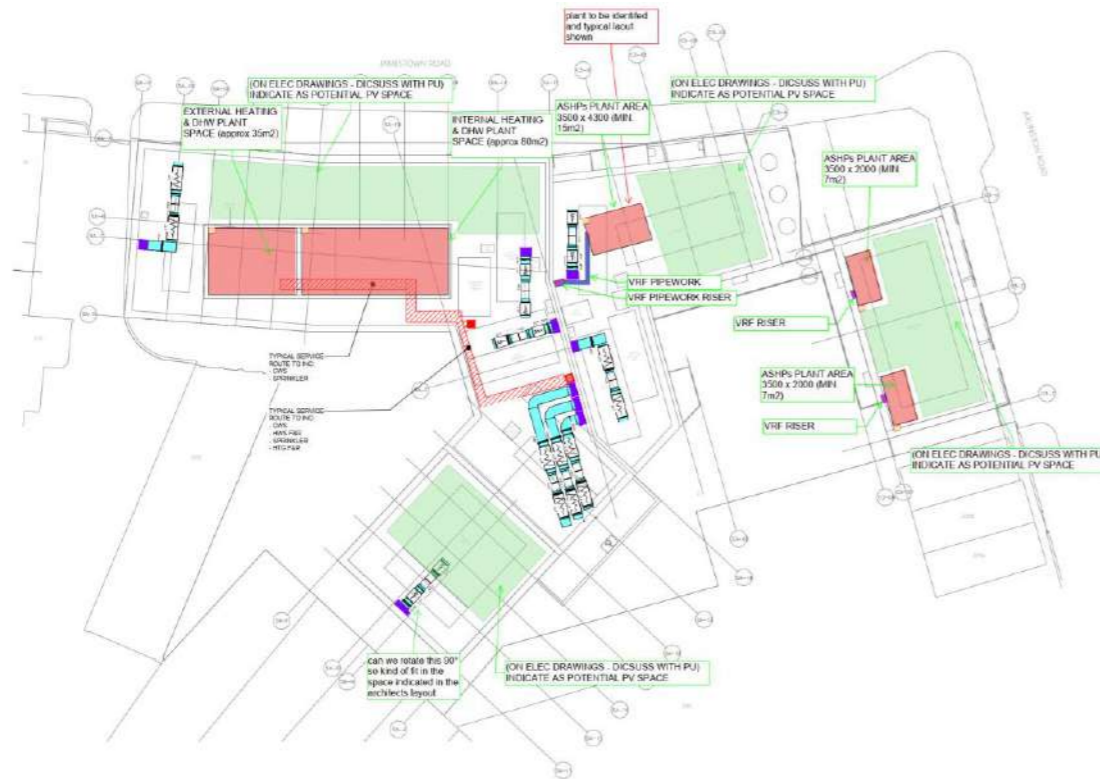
Jamestown Road Indicative Roof Plan Markup (JATRD-WWL-DR-CS-XX-11-1071)
